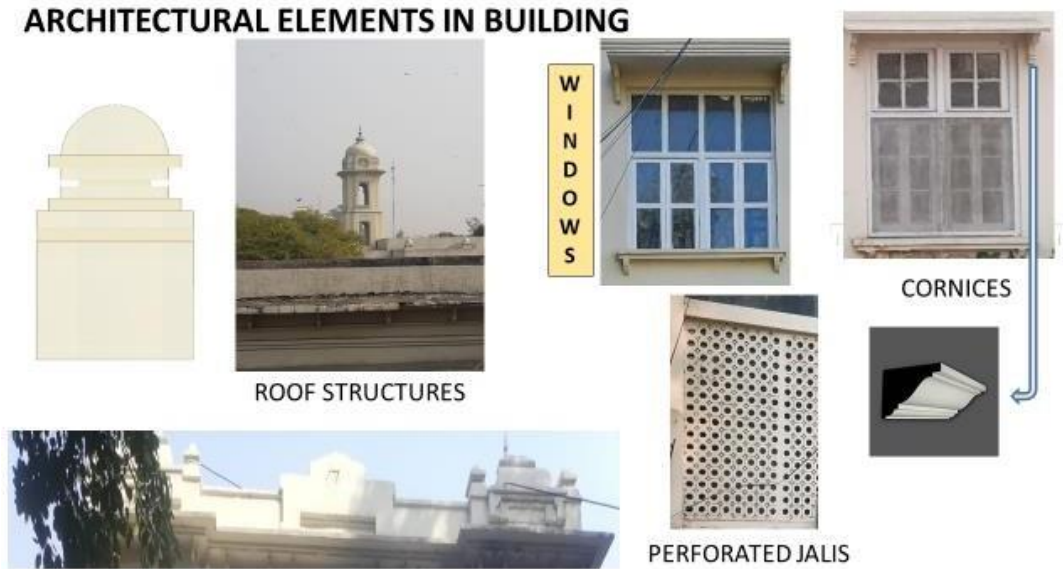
; DETAILS OF ARCHITECTURAL ELEMENTS IN GANGA RAM BUILDING
